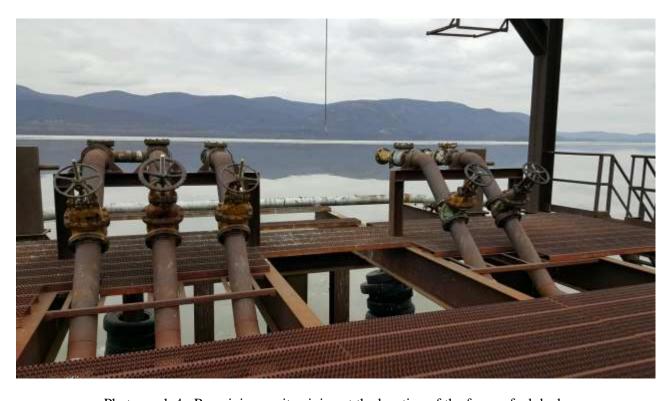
Remaining onsite piping at the location of the former fuel dock.
